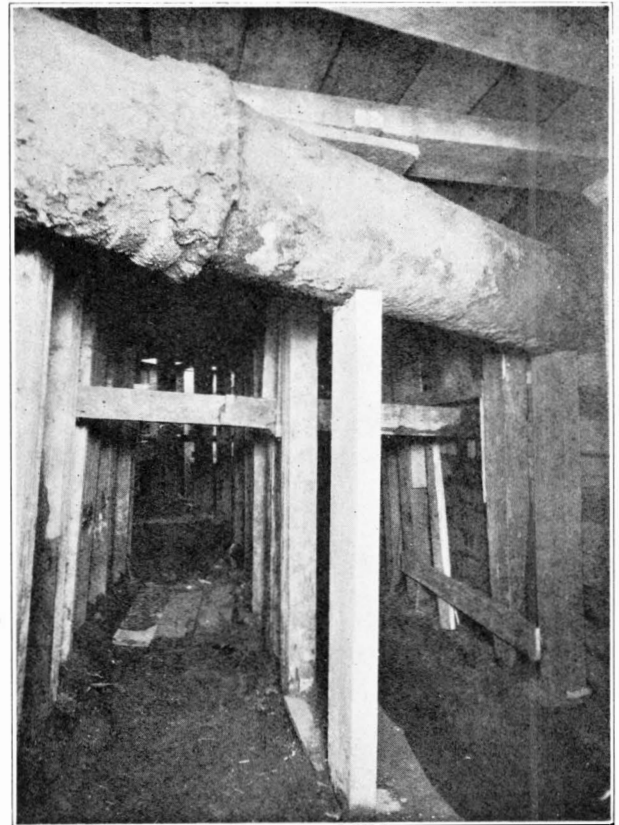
TUNNEL AT JUNCTION OF BLACKFRIARS STREET AND CHAPEL STREET.
